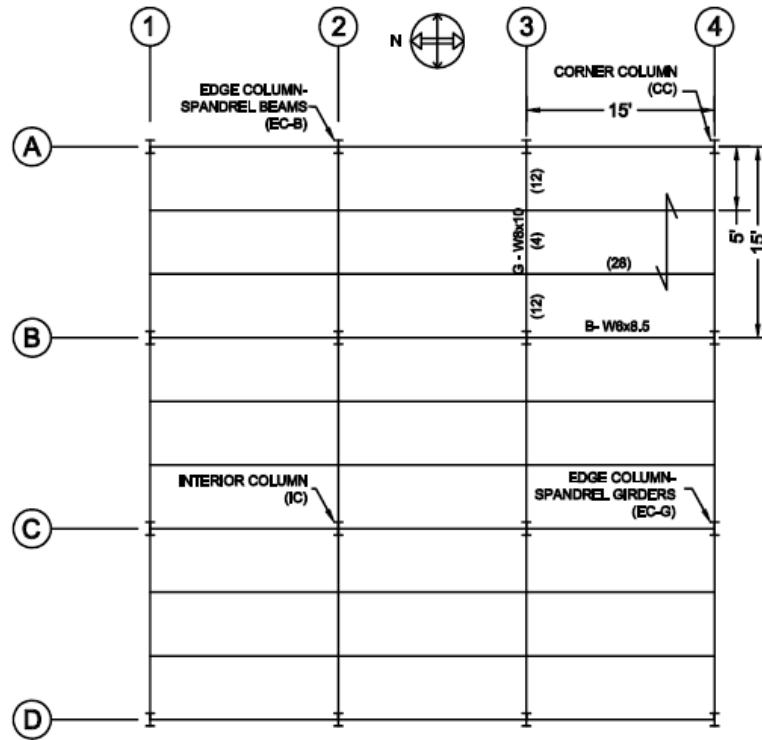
Floor system layout with the locations of the column removals (Johnson 2014)
